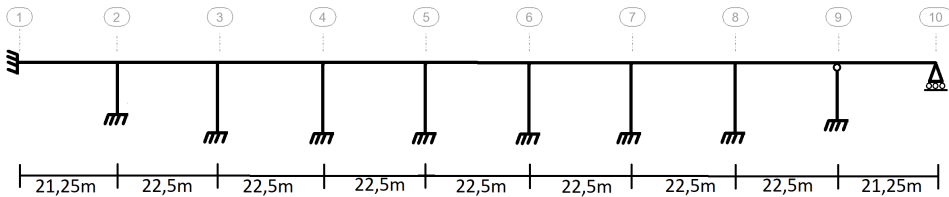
Statically system of Elgeseter bridge, longitudinal direction
